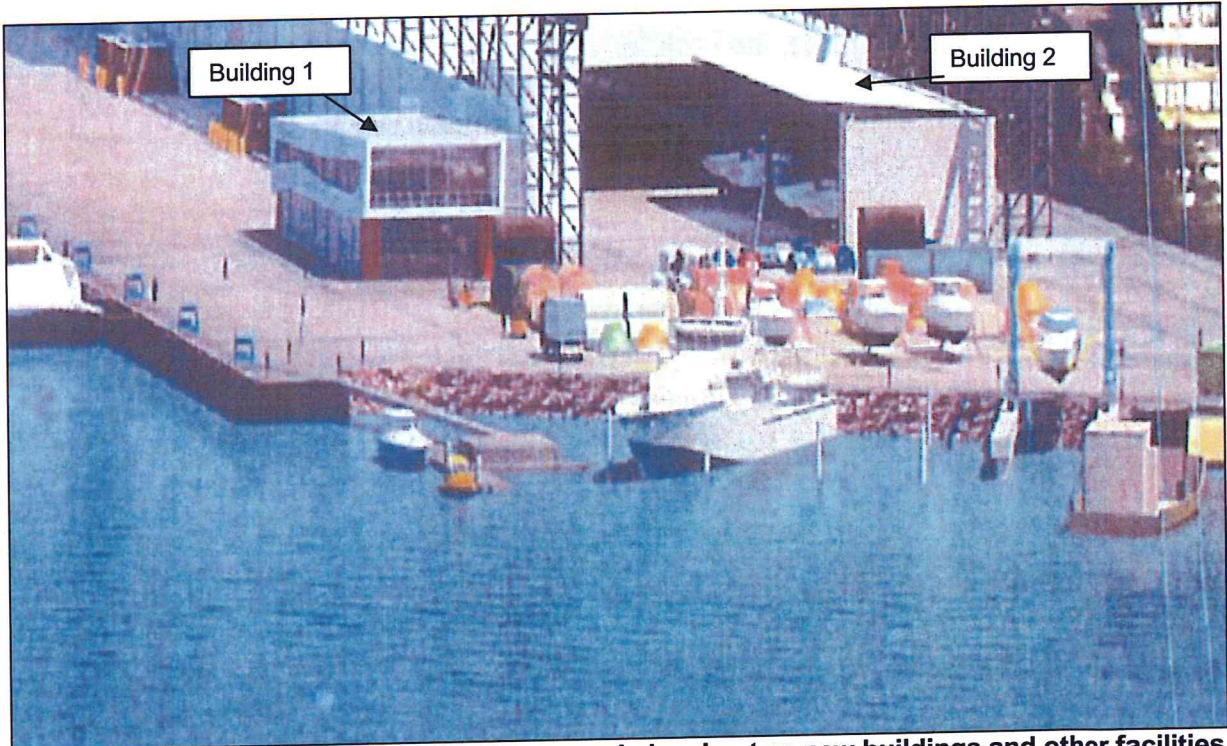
Photomontage of the original proposal showing two new buildings and other facilities
